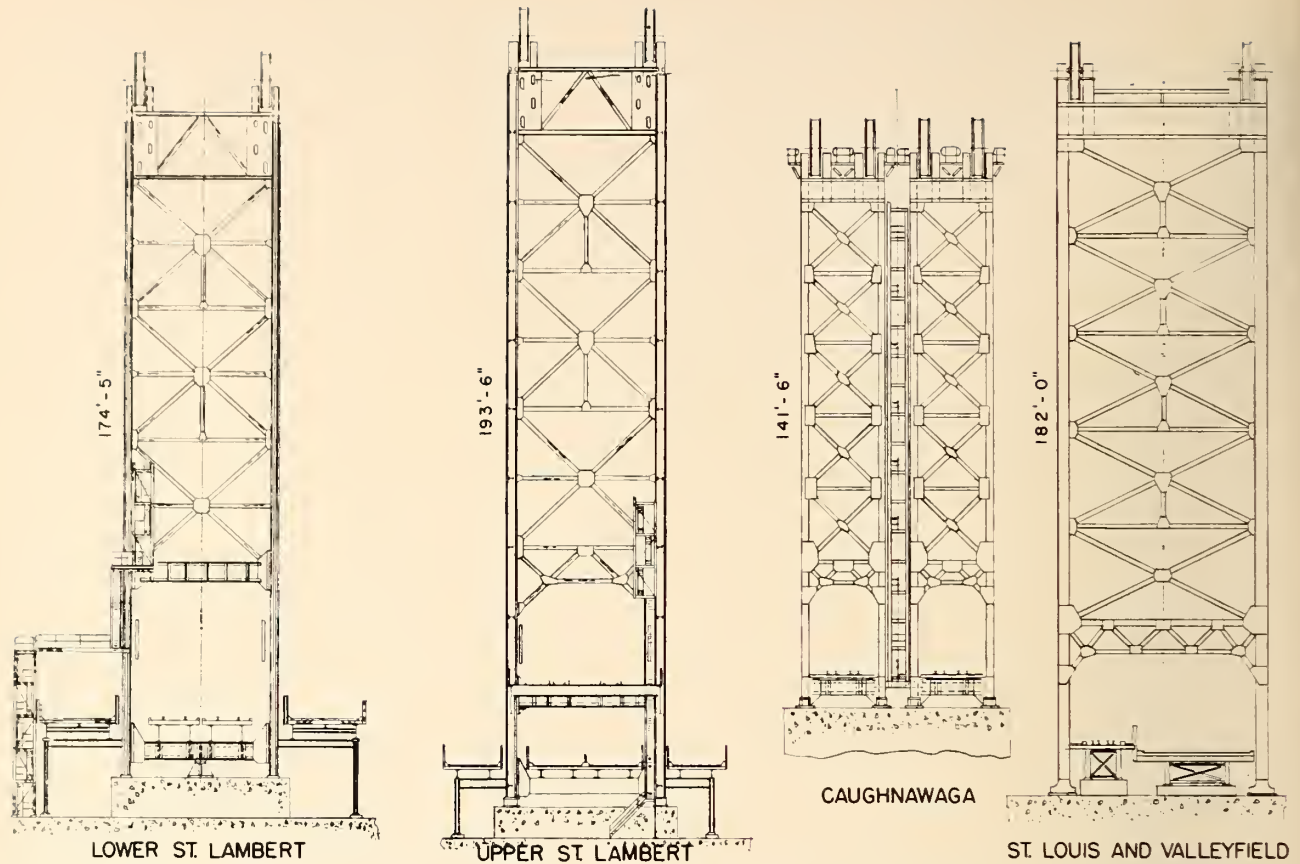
Cross Sections of the bridges showing the various arrangements of railway tracks and roadways to suit existing bridges. Dimensions shown are from bottom of tower leg to centreline of counterweight sheave.
